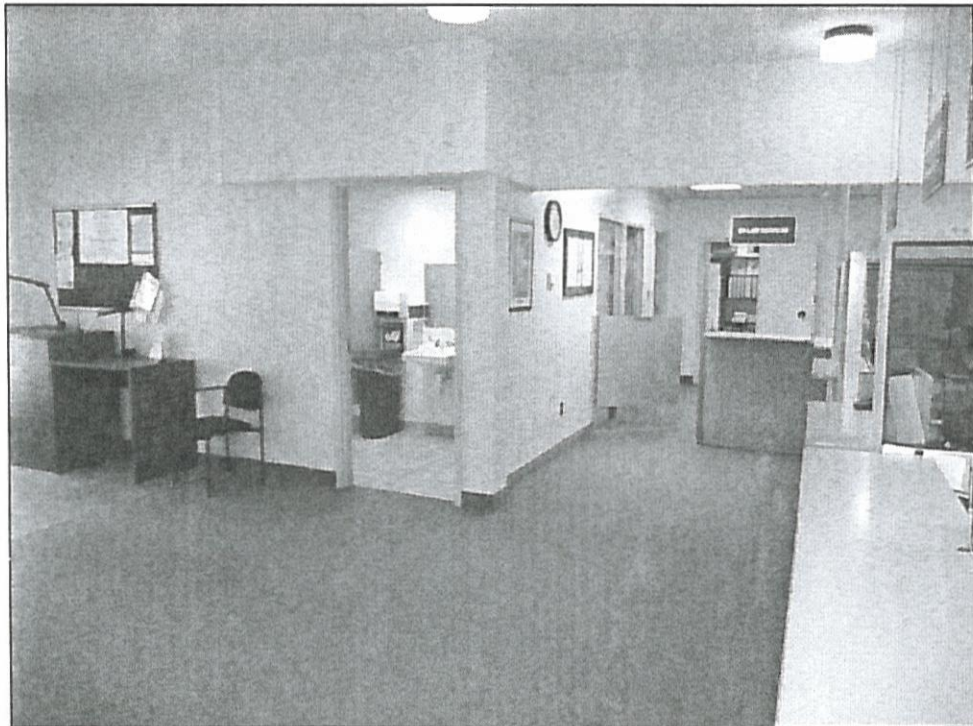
The Public Washrooms are Located Too Close to the Front Counter
